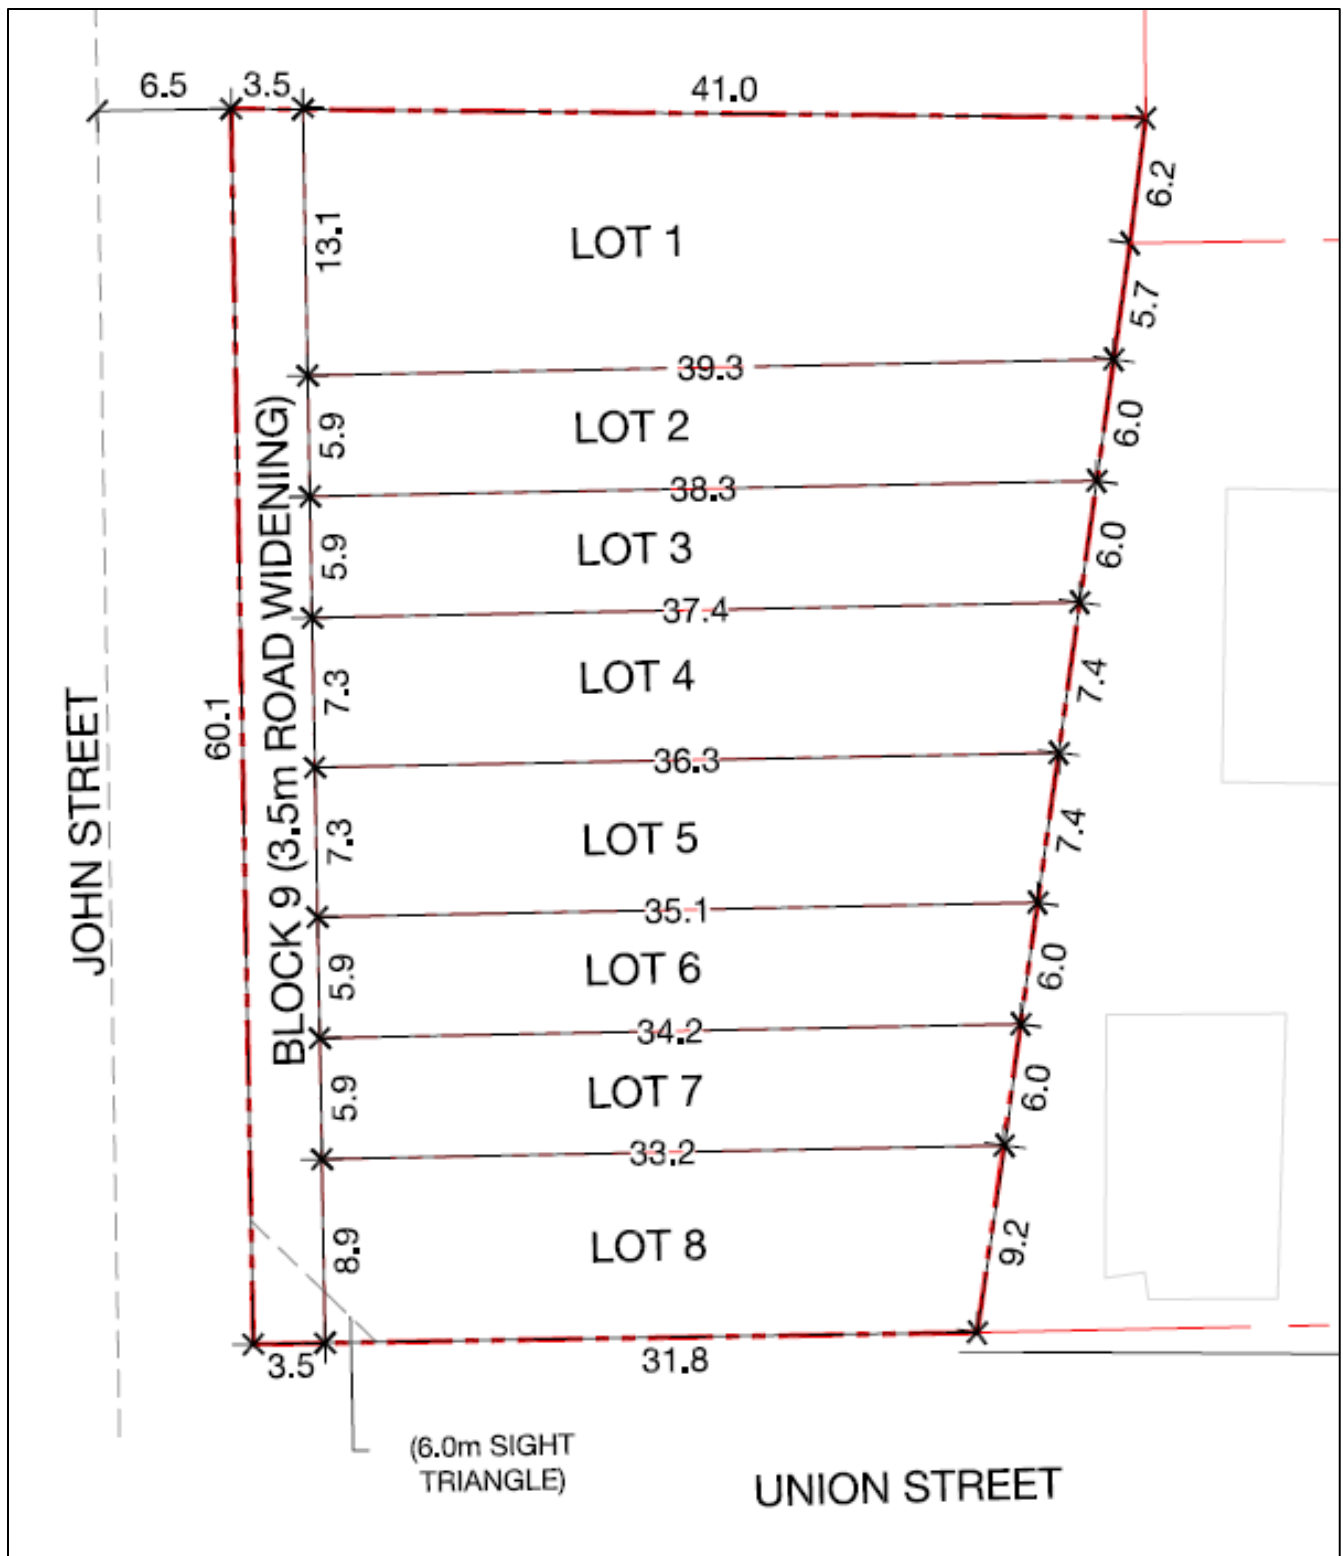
Draft Plan (Source: Fotenn Planning + Design)
